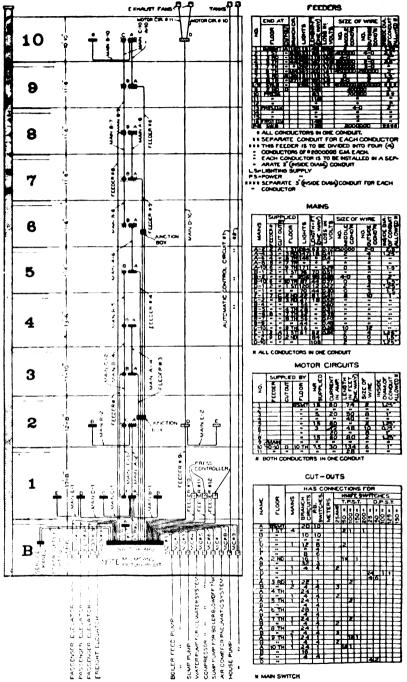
Wiring of an Office Building. Diagram Showing Arrangement of Feeders and Mains, Cut-Out Centers, etc.
